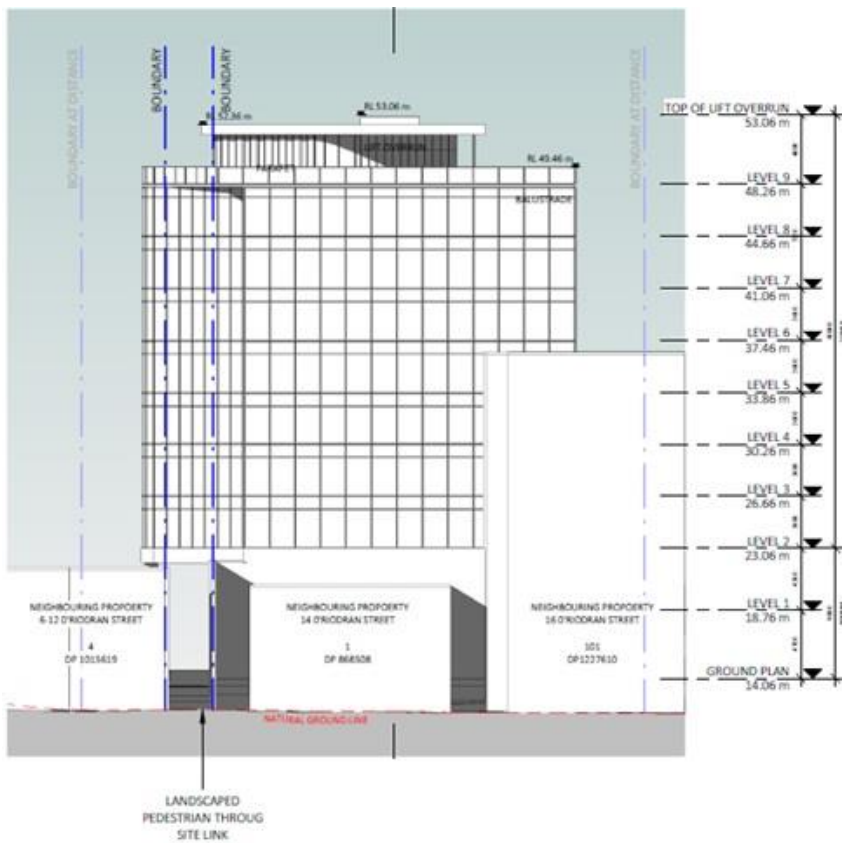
Reference scheme west (O'Riordan Street) elevation.
